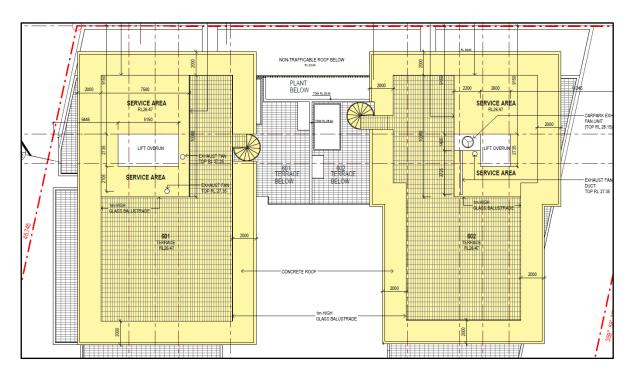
| Original proposed modifications to the Roof Level (Source: Applicant's Application)
